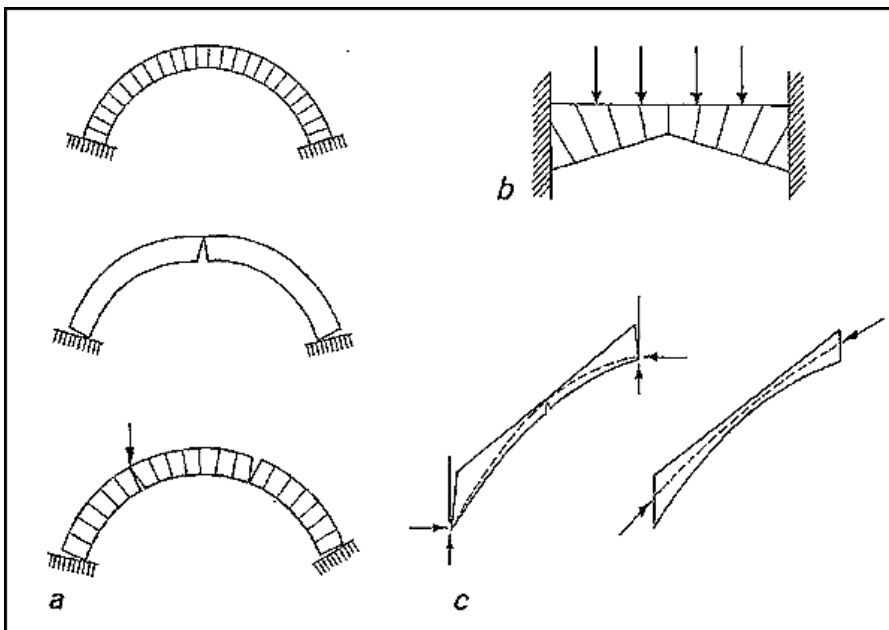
Masonry arches: (a) (from top to bottom): fitting perfectly between abutments; cracking to accommodate an increased span; at collapse by the formation of four 'hinges'; (b) flat arch; (c) flying buttress: (left) passive state; (right) working state
